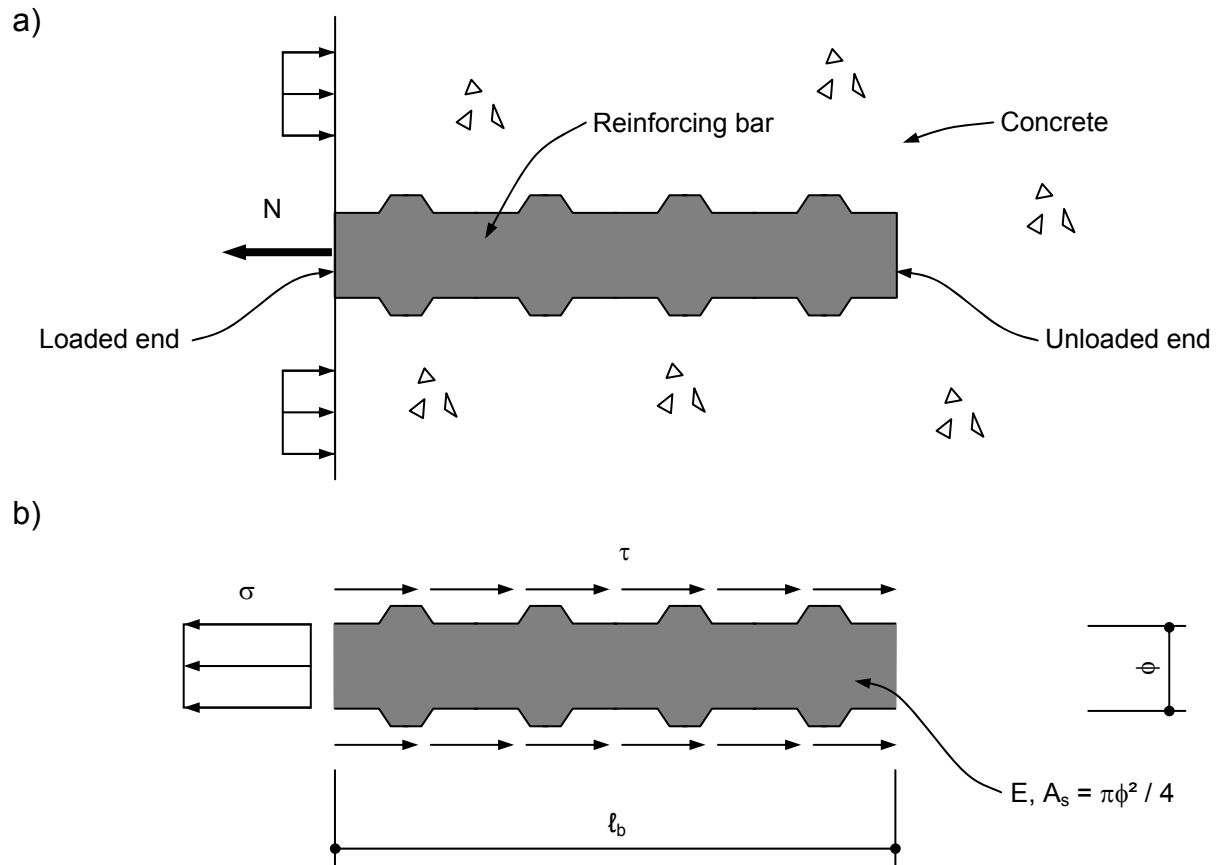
a) Schematic of pullout test; b) Tensile stress and bond stress of a reinforcing bar element with one loaded and one unloaded end
